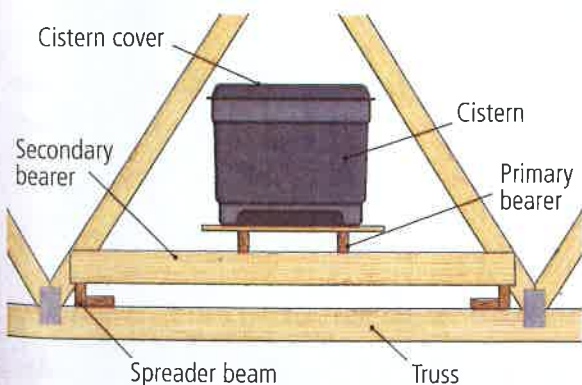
Cold water storage tank, supported to spread the load over a minimum of four joists.
